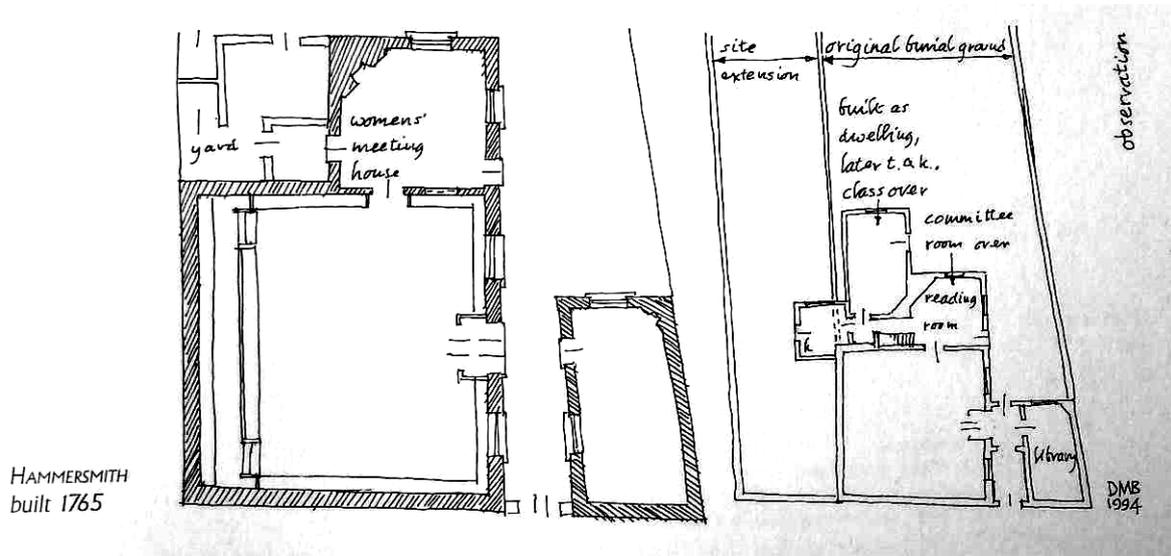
Plan of 1765 meeting house (from Butler Vol. 1, p. 401)
